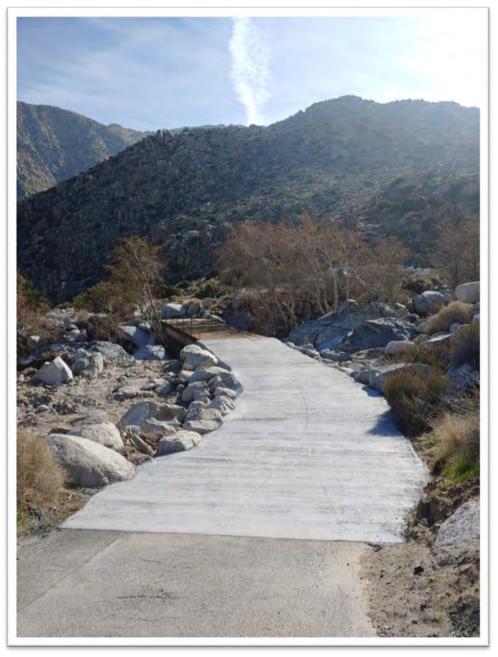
The west approach to the Falls Creek Bridge after repairs.
